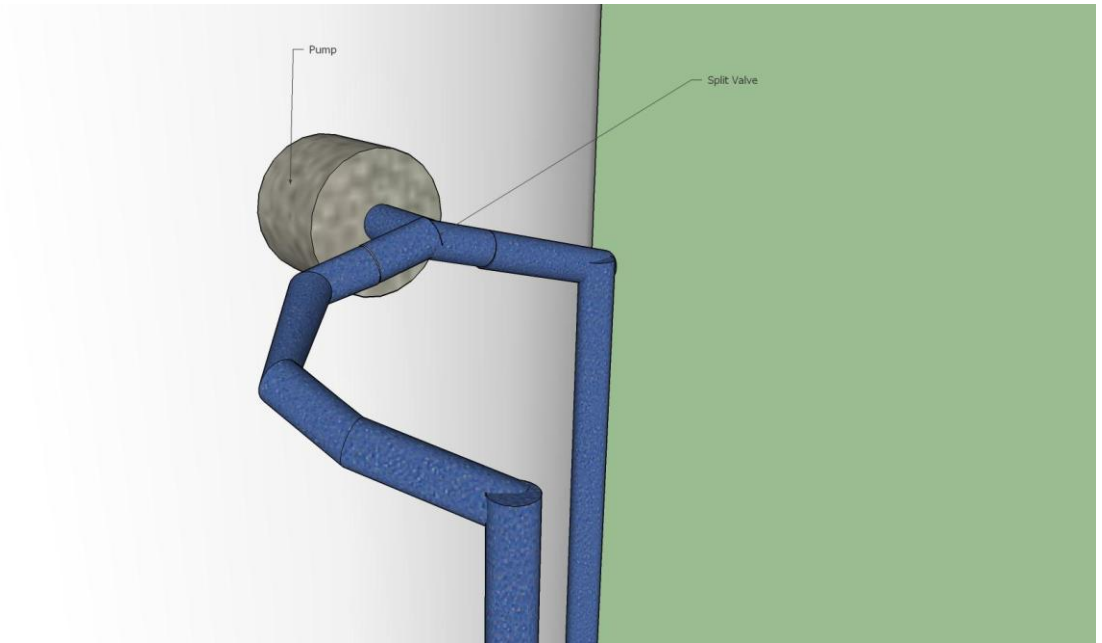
Upper connection, showing pump and split valve. Alternatively you could disconnect the pipe and switch them out.
